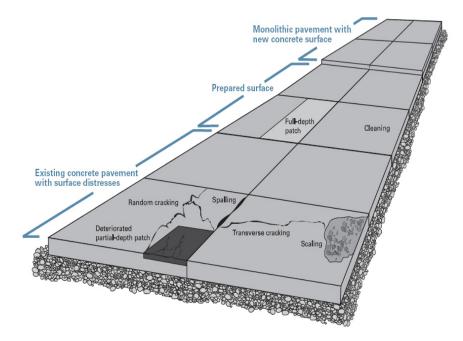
Notable distress on existing pavement and possible repairs for BCOs [4]
